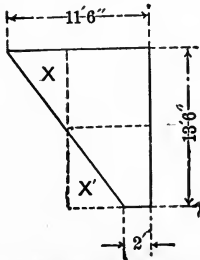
DEVELOPED PLAN OF ONE SIDE OF DORMER ROOF
